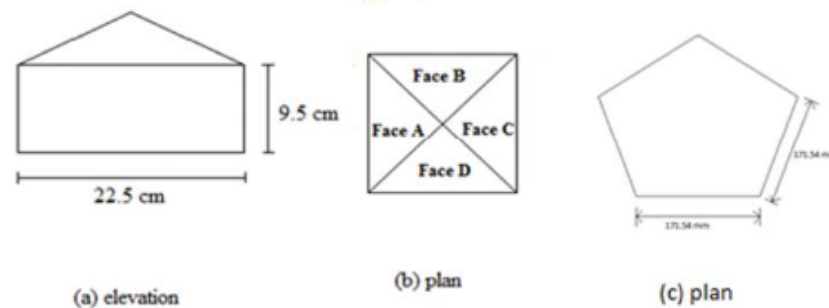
(a) Elevation and (b) plan of rectangular and (c) plan of pentagonal shape building model, and computational domain of building models (Singh and Roy, 2019)
